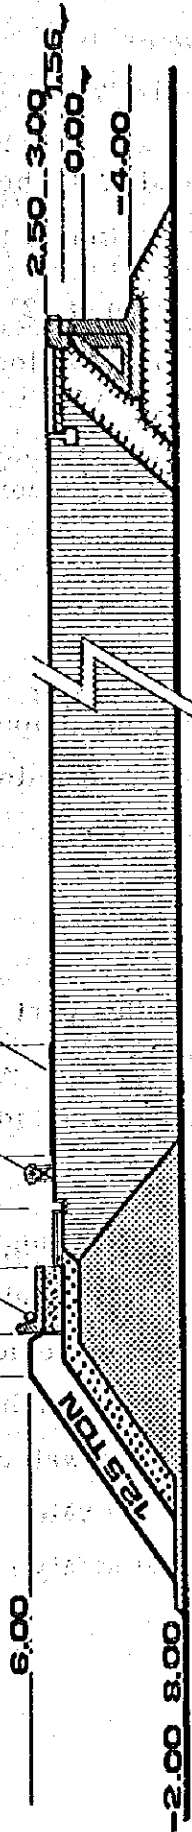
TYPICAL SECTION OF BREAKWATER AND REVETMENT (2)
